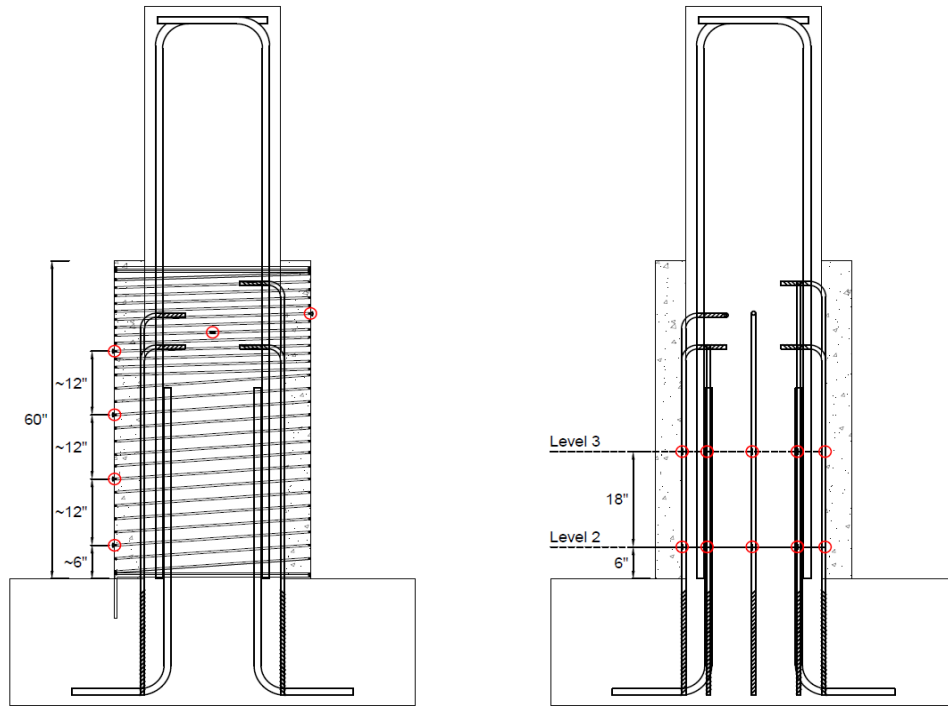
Strain gages layout in column ties: (a) Specimen R-S-R-LTi-90 (left) (b) Specimen R-S-D-LTi-90 (right)
